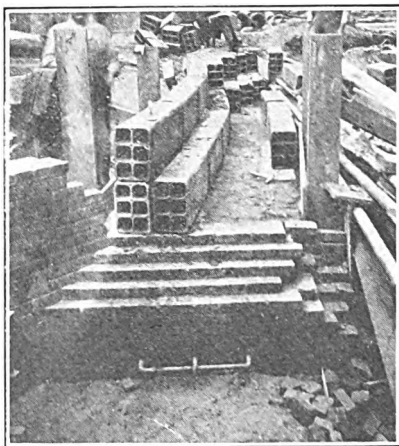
Sixty-duct run of terra-cotta multiple conduit entering manhole at Eighth and Market Streets.
